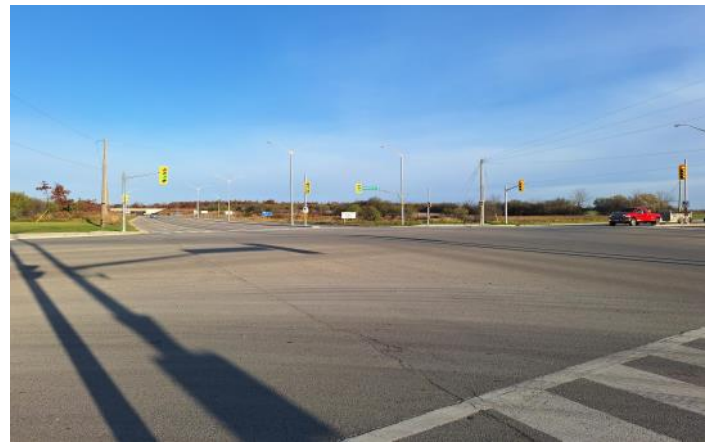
View of the Burnhamthorpe Road West and Neyagawa Boulevard intersection (looking north).
